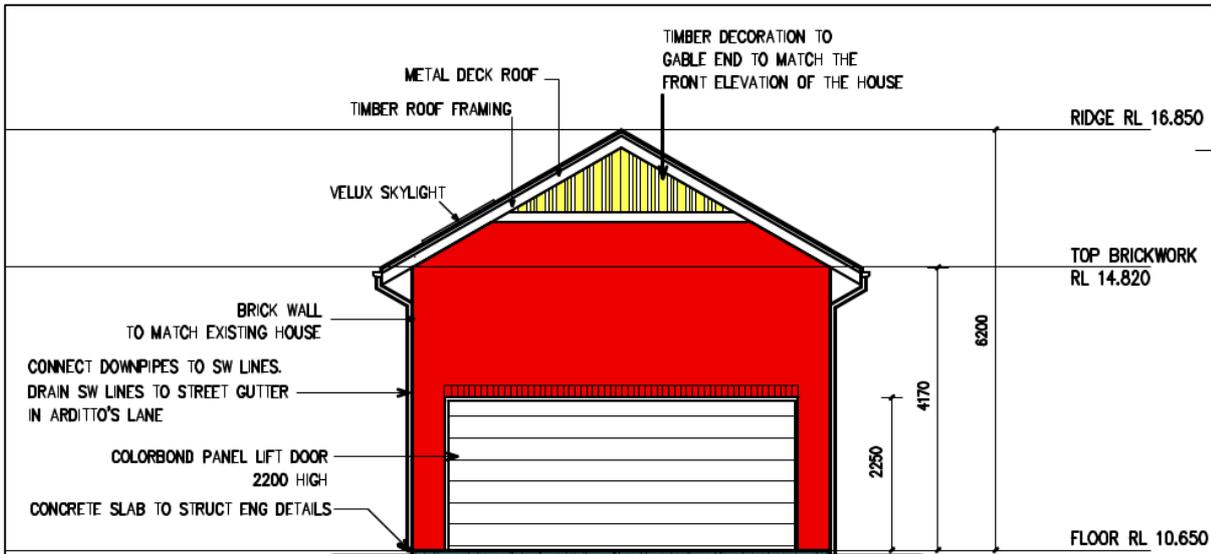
Proposed northern (Ardittos Laneway) elevation.
